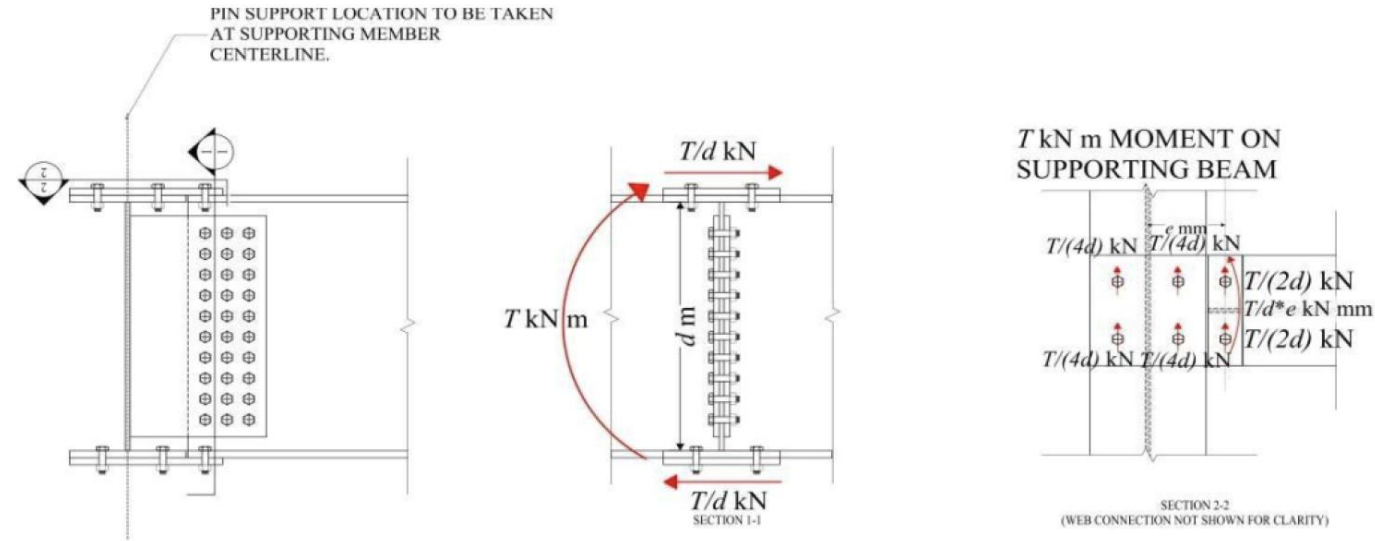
Load Path Detailing Considerations for Axial Force Transfer (Bearing Type Bolts)
